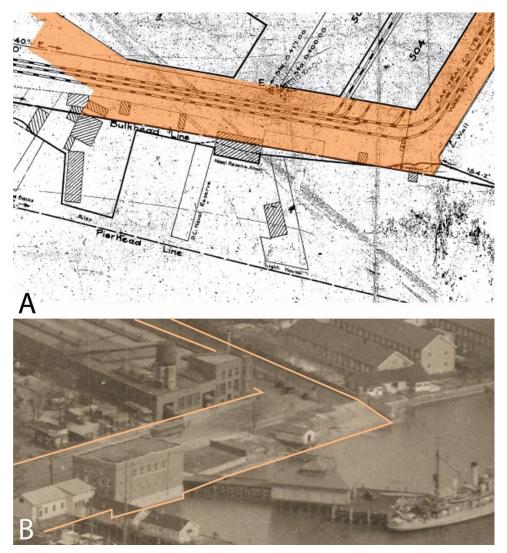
b: (A) 1912 existing conditions plan drawn by the Army Corps of Engineers showing the cultural landscape and the structures within its boundaries (orange); (B) 1925 aerial photograph of the cultural landscape showing the buildings and structures within the boundary of the cultural landscape (Excerpts from ETIC\_WEPO\_801\_81002\_[id176436]; from Record Group 18-AA, "Airscapes" of American and Foreign Areas, Box 150, Folder 24, National Archives and Records Administration; annotated by CLI author)
